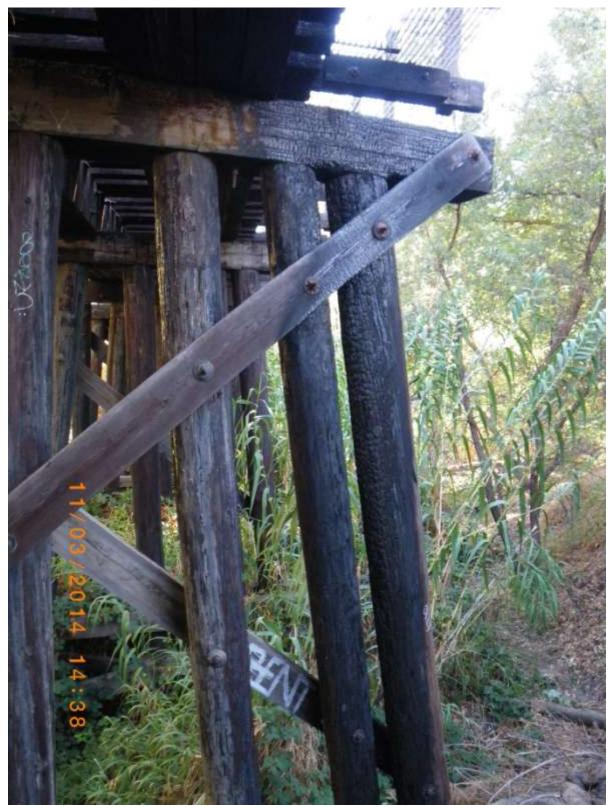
Charred pilings on railroad trestle, north side. 3 November 2014
